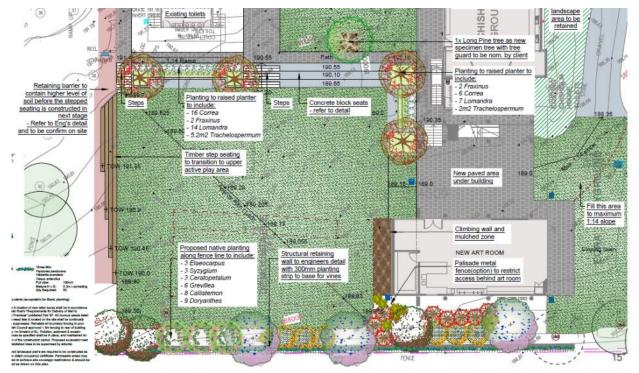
Extract of Landscape Plan (Source: Conzept Landscape Architect)
